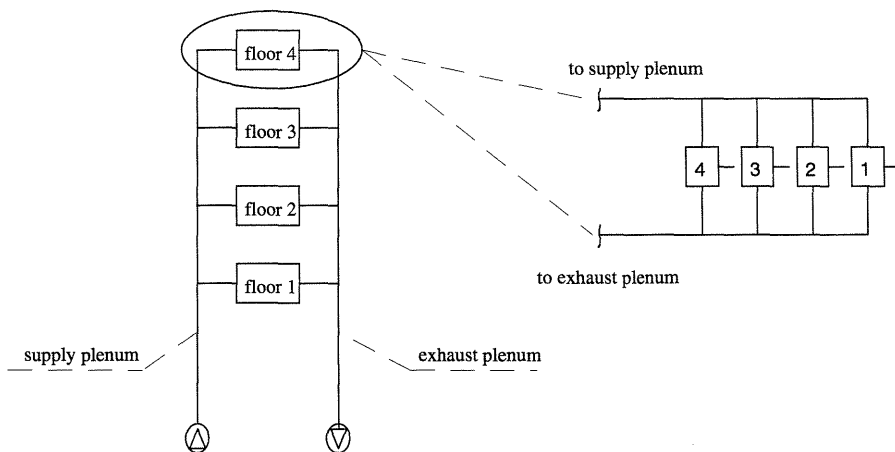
Layout of supply-exhaust ventilation system for four floors and four rooms on each floor.
